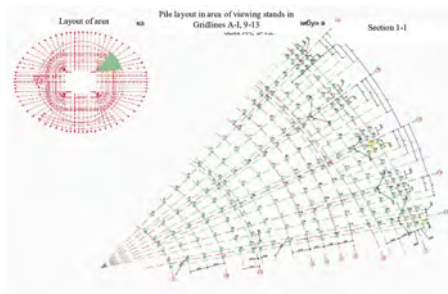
Principle of pile arrangement under viewing stands for one of segments.
